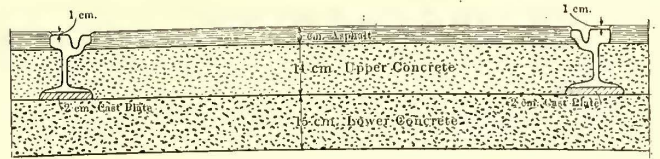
Berlin Concrete Track—Ordinary Concrete Construction in Asphalt-Paved Streets
